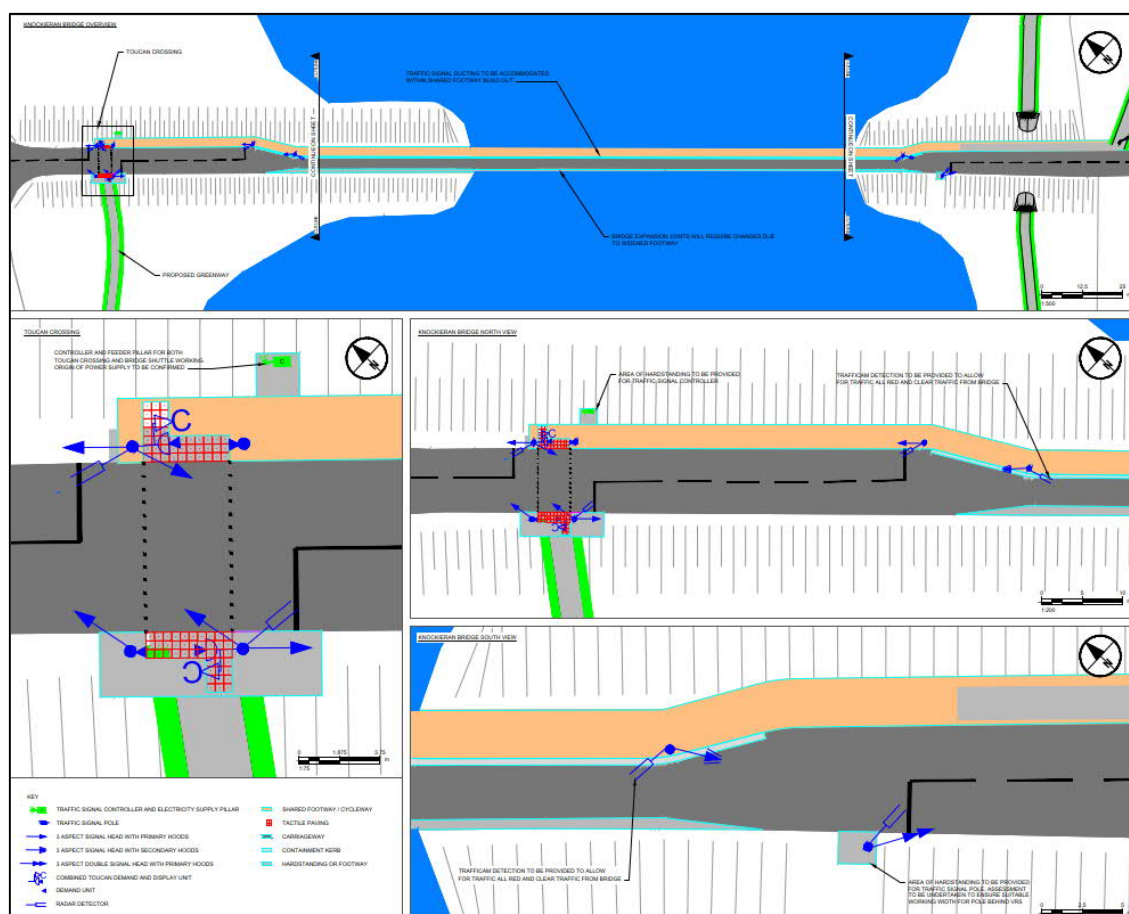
Proposed Shuttle Working Design, Knockieran Bridge
